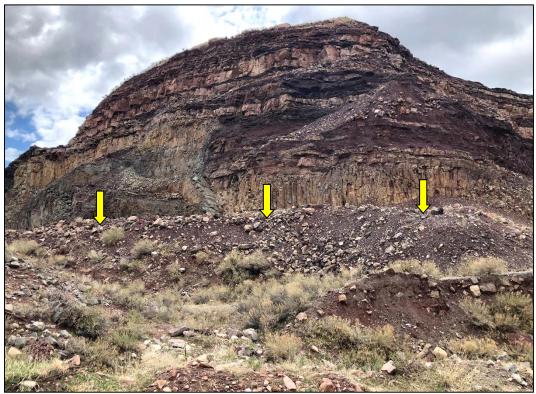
View looking southeast, showing closer view of northwest-facing highwall that exists between the two quarries. This highwall was partially backfilled (indicated) in the early 2000's during construction of the Quarry 2 access road ramp. In TR-5, the operator proposes constructing a rockfall catchment berm and chain-link fencing along the top of this backfill.
